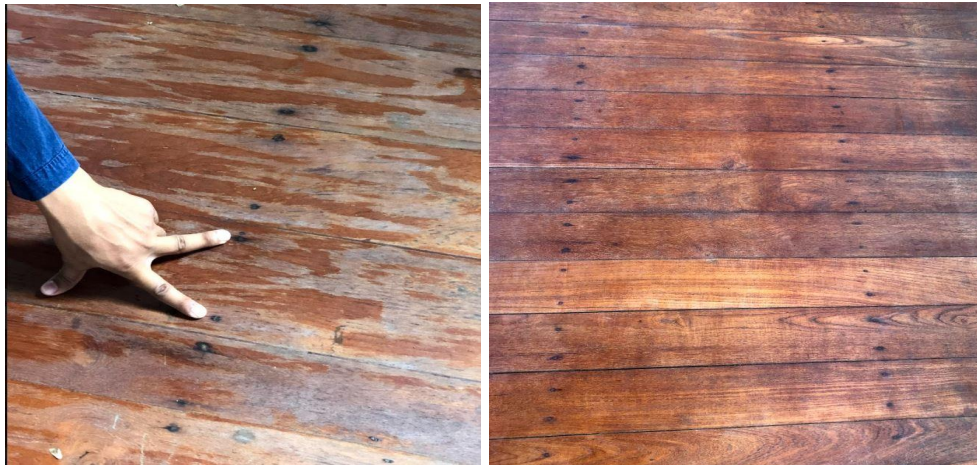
Photos of wooden floor at Mrigadayavan Palace after previous restoration.
